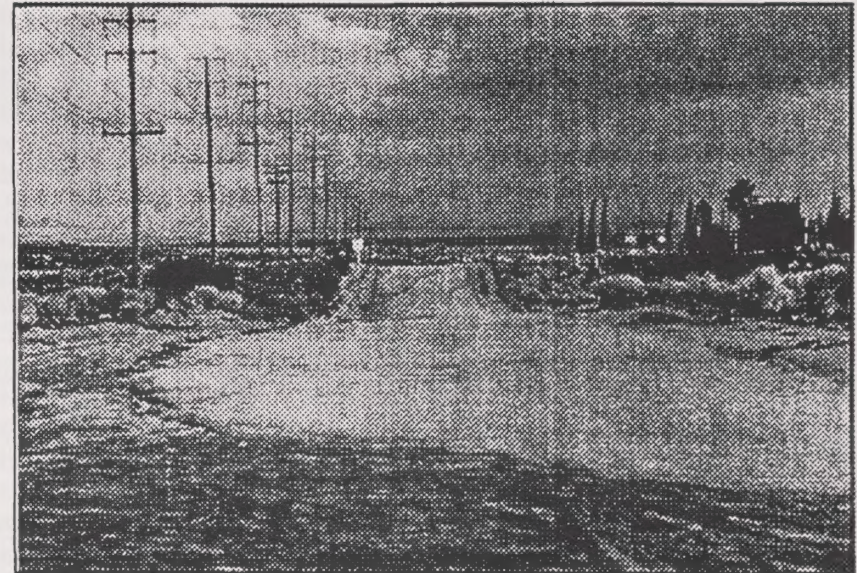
Avenue S west of Tovey Road, facing east. The future road will be 10 feet higher than the existing road in this location.
